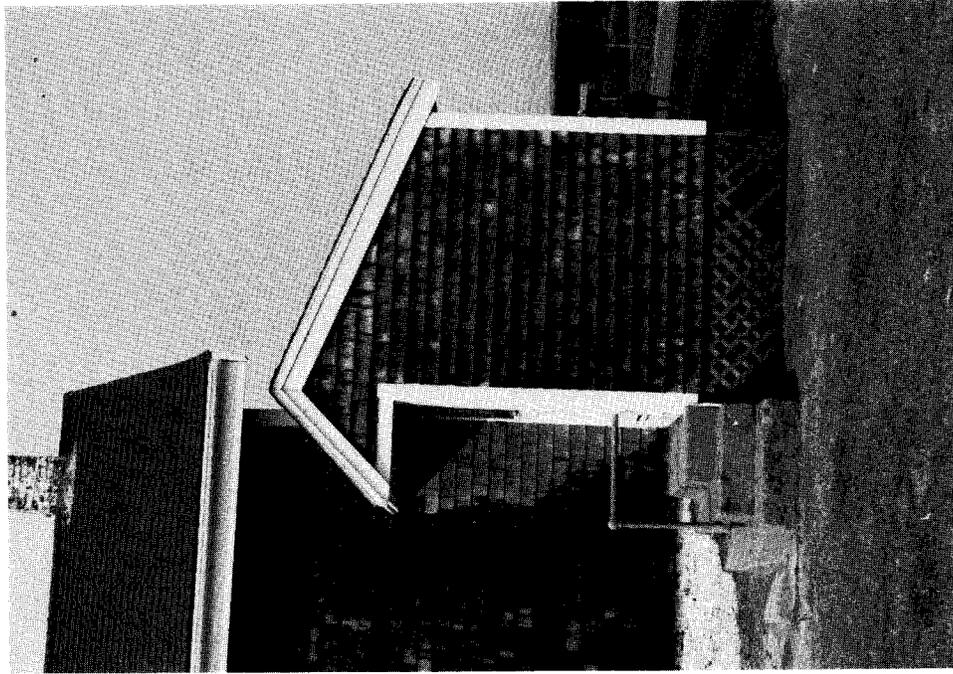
Keeper's Dwelling ell, east exterior elevation of north vestibule.
